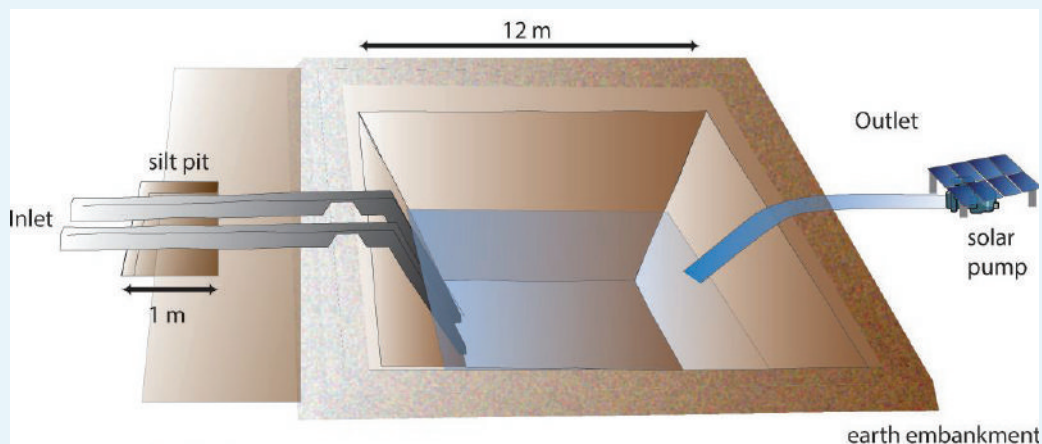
Basic design of a trapezoidal farm pond (or underground tank)
